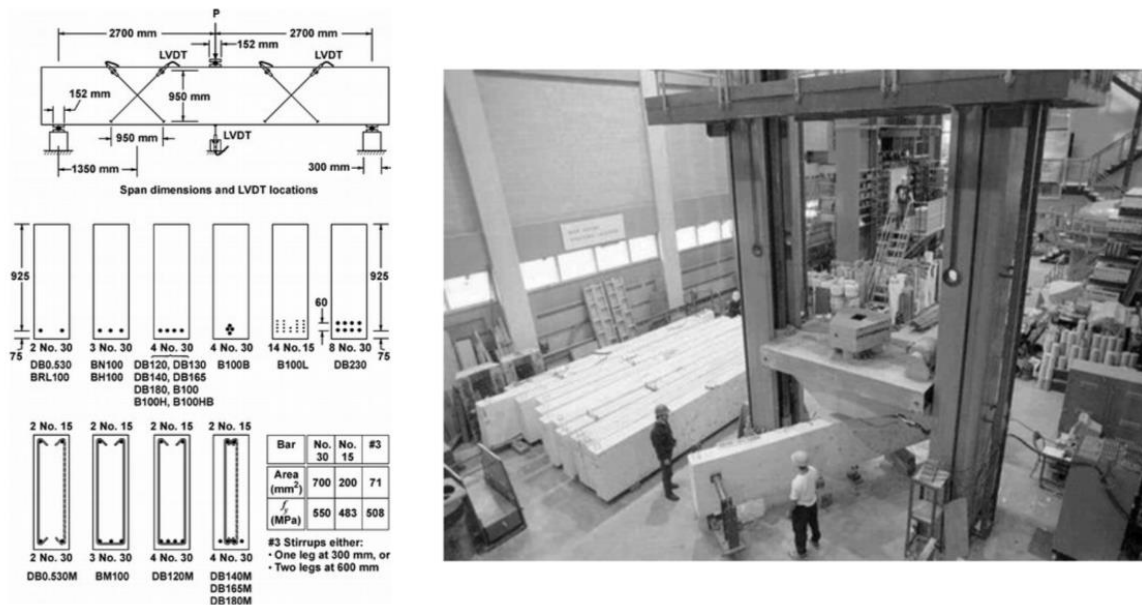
Specimens and test setup (from Angelakos et al. 2001)
